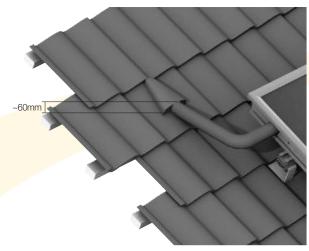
Detail View of Solar Collector Field Connection - On-Roof Systems
